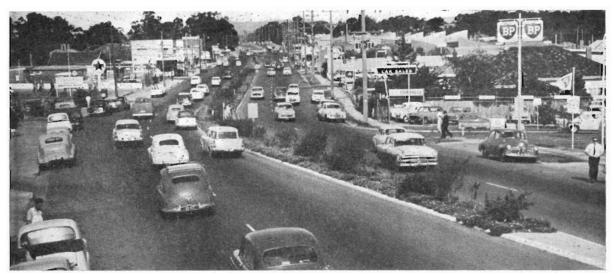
Maroondah Highway. New dual pavements at Blackburn. Nunawading City.
